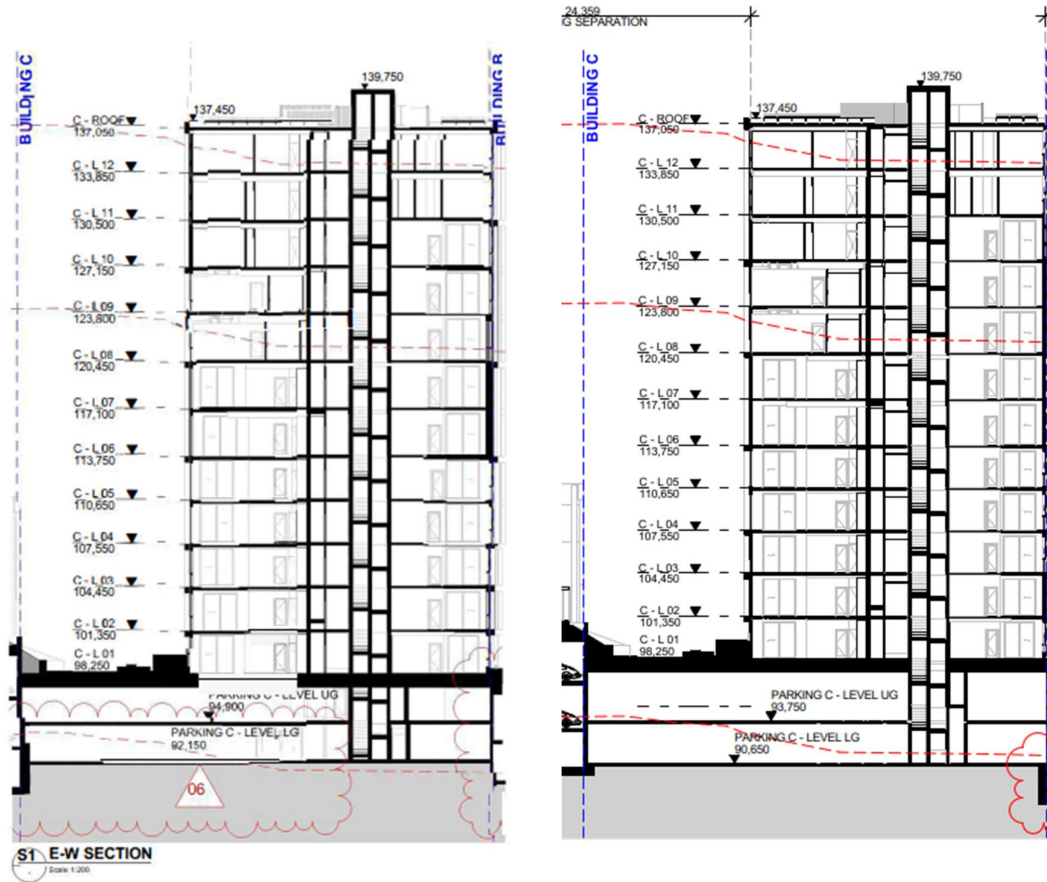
Approved and Proposed E-W Section of Building C (1 of 2)
